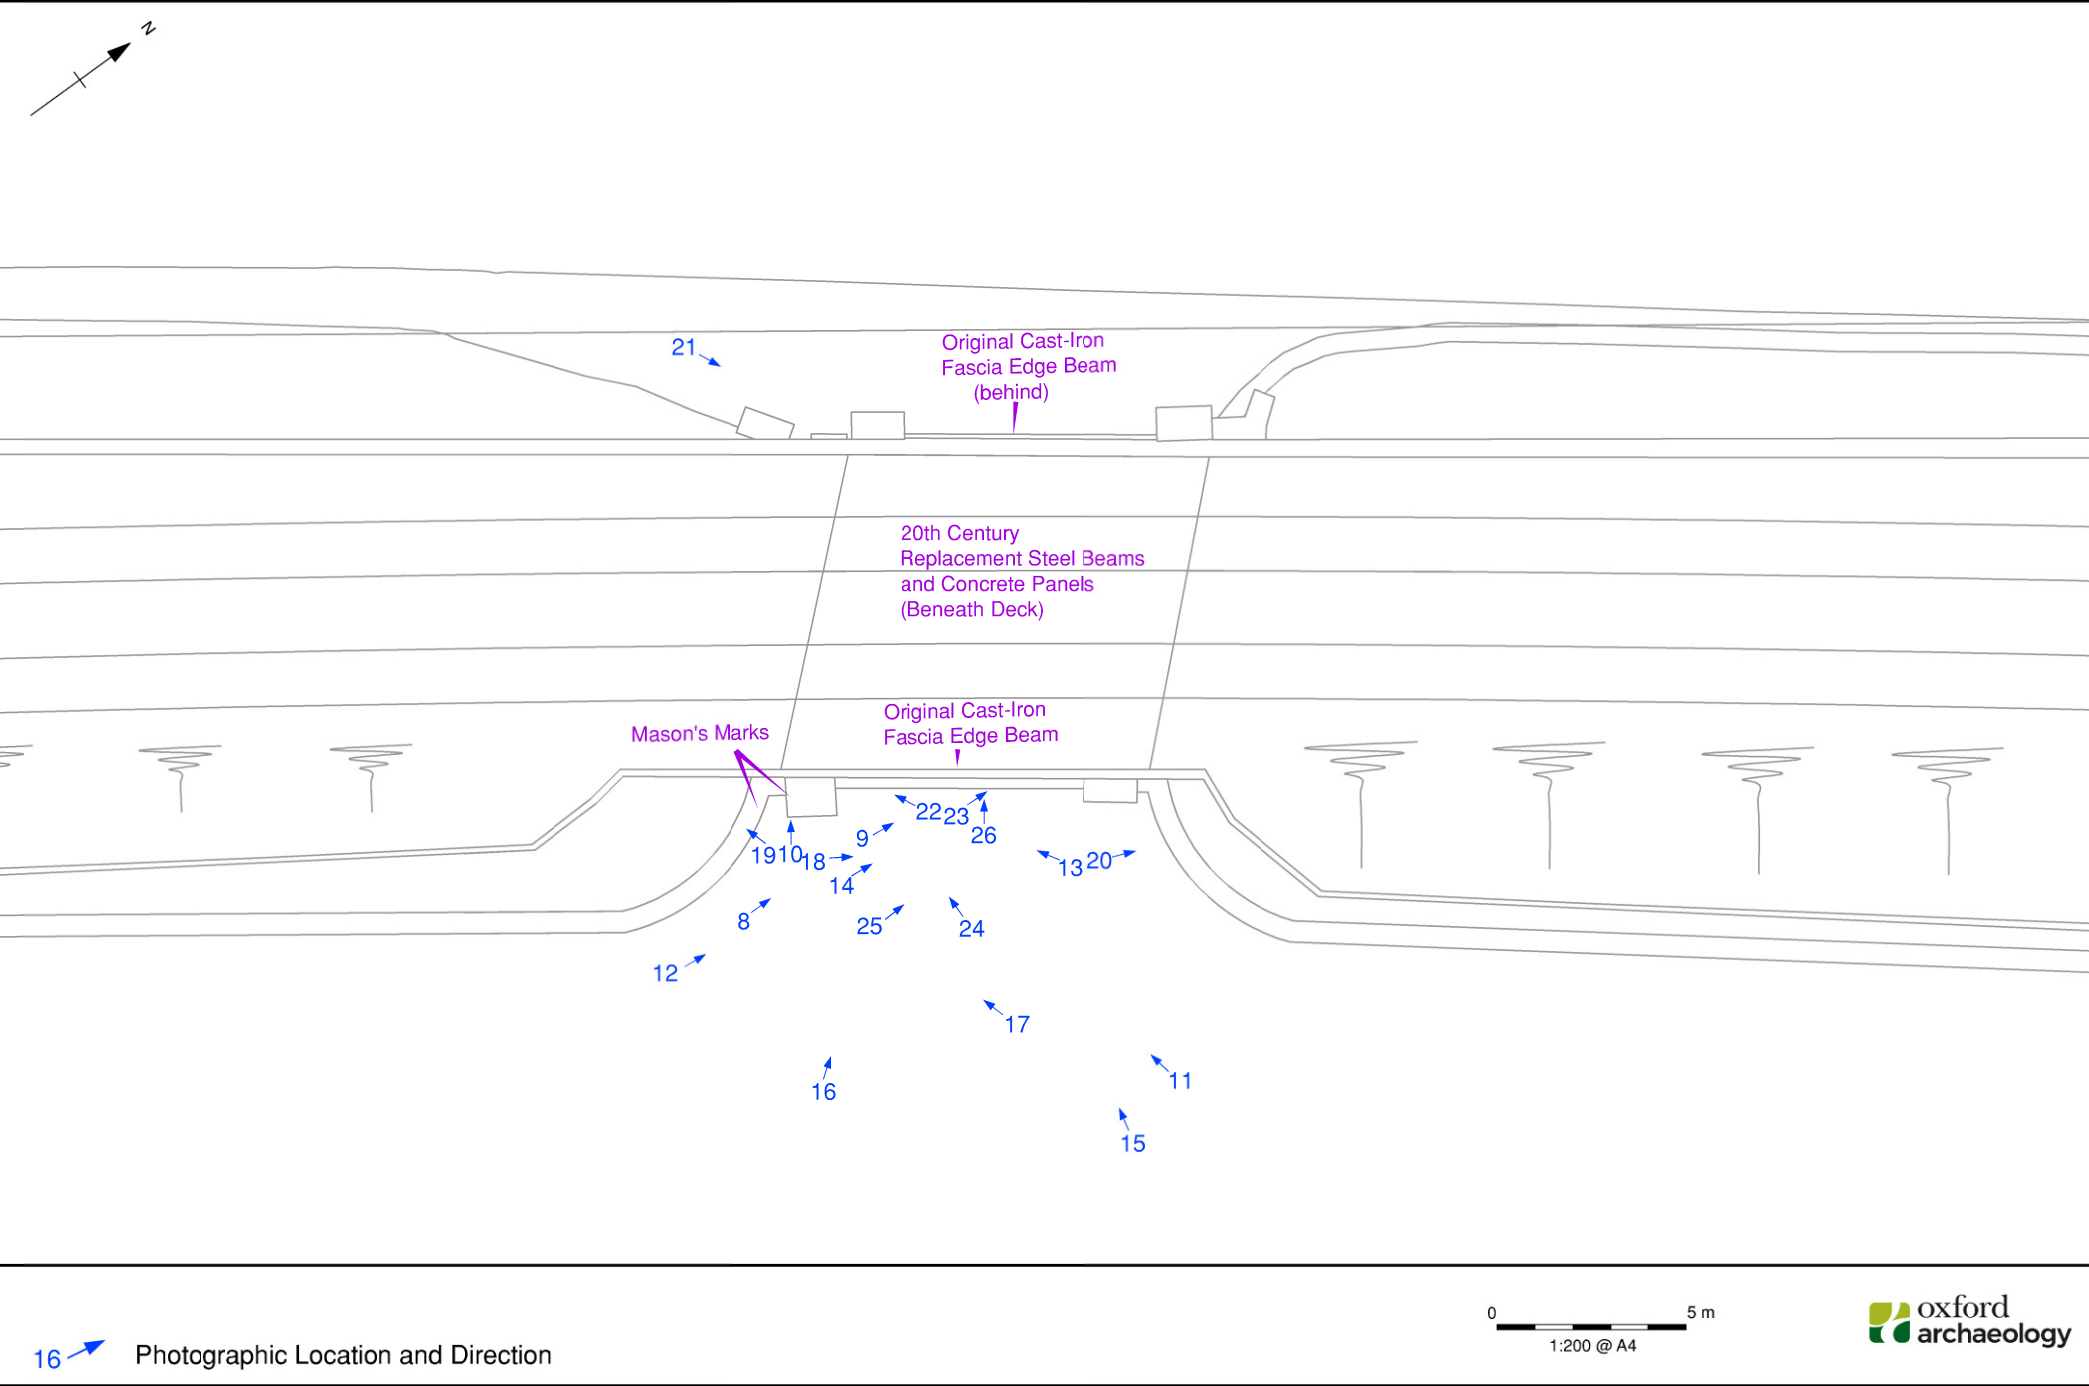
Toad Holes Underbridge (MDL1/12) photographic plan
